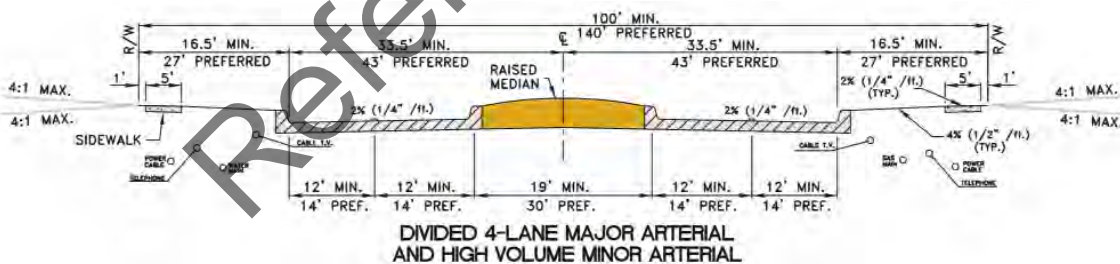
Major Arterial Minimum Cross Section or High Volume Minor Arterial
